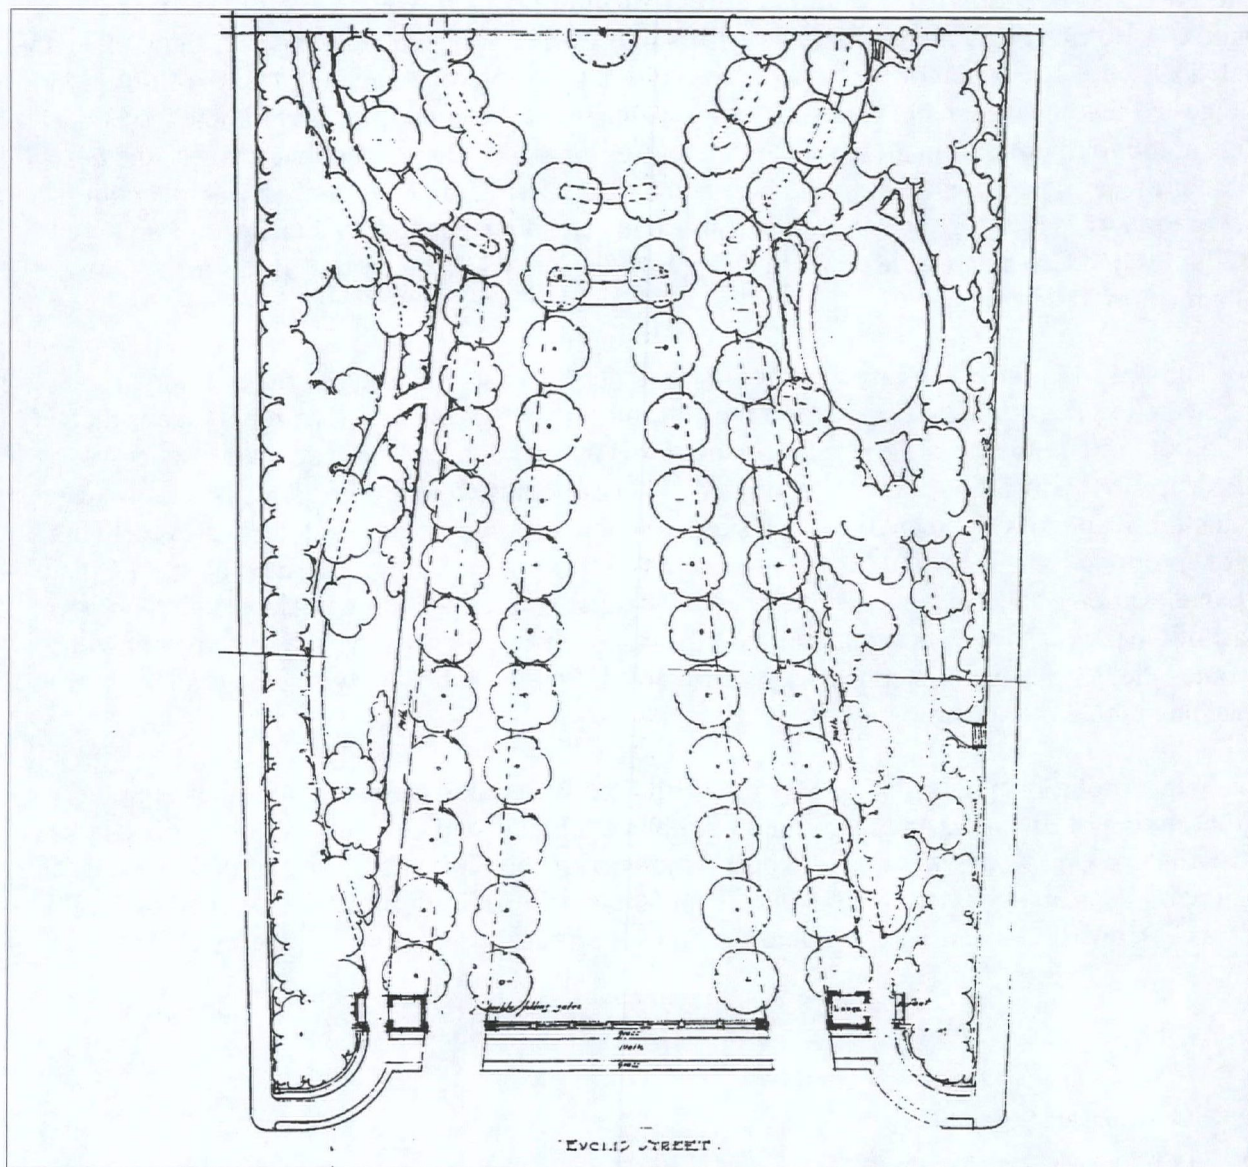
1913 proposed plan for the northern portion of the mall (National Archives RG 79, 327.46A). Note that this 1913 plan, as prepared, orients north at the bottom of the drawing with 15th Street on the left side and 16th Street on the right side.
